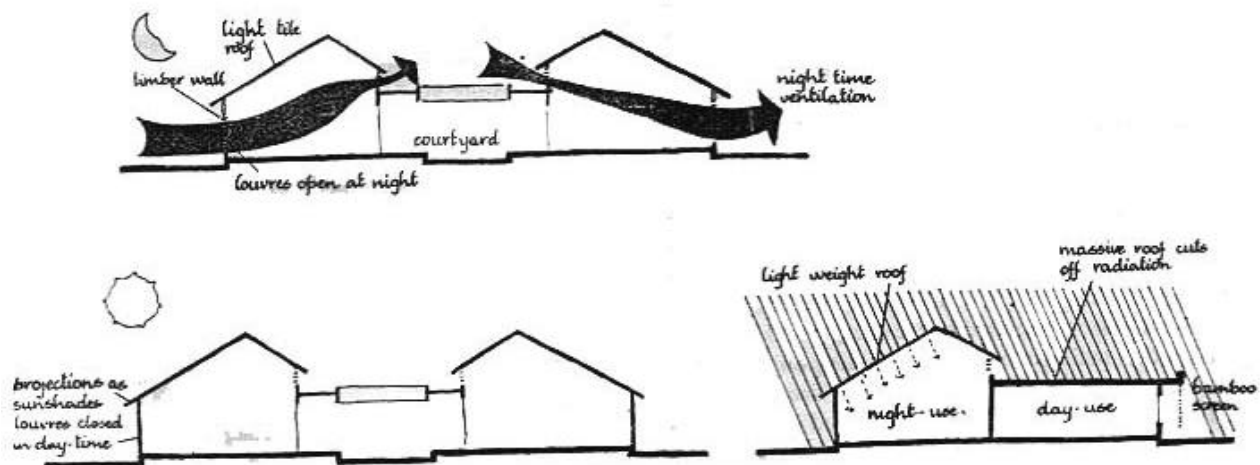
Sections through a hostel building module. Light-weight construction is used for bed-rooms while day-use space is massively built
